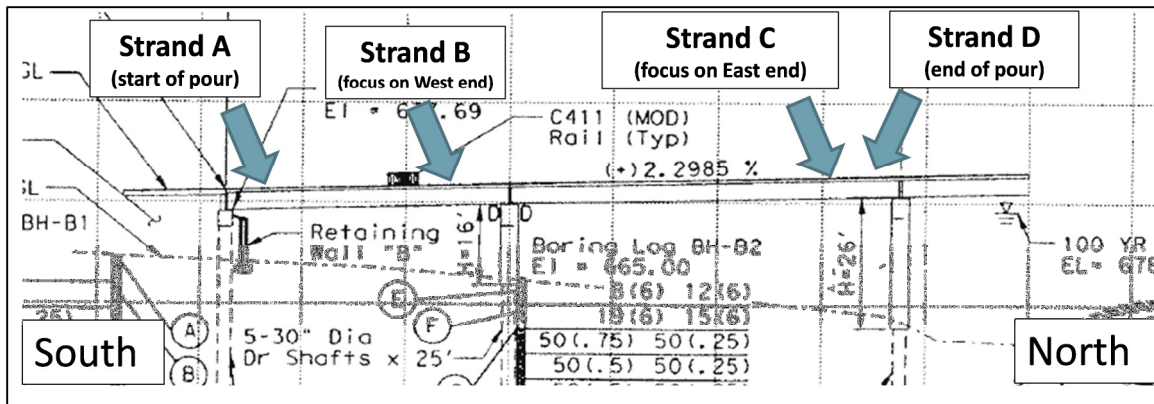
iButton strand layout for Georgetown bridge deck summer pour.
